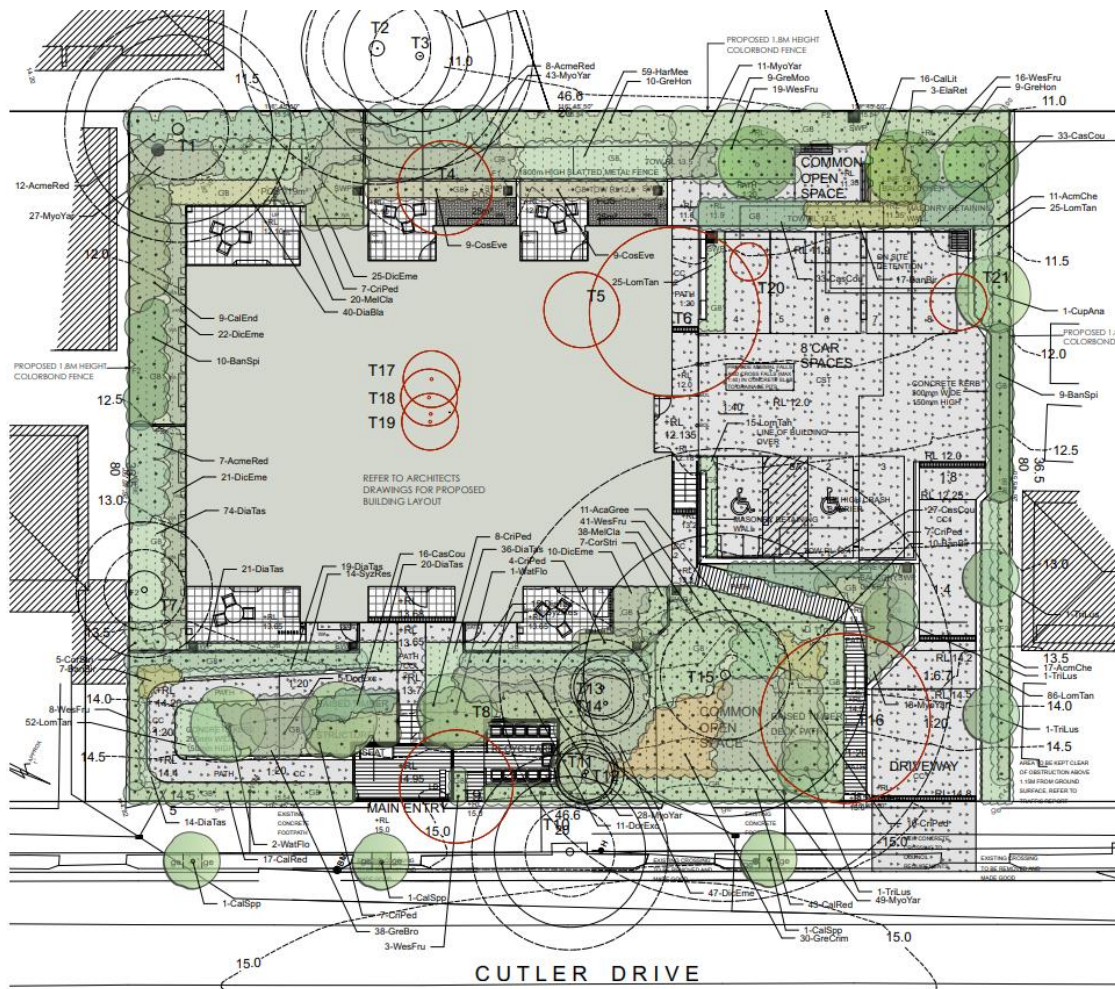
Landscape Plan Source: Barry Rush & Associates Pty
